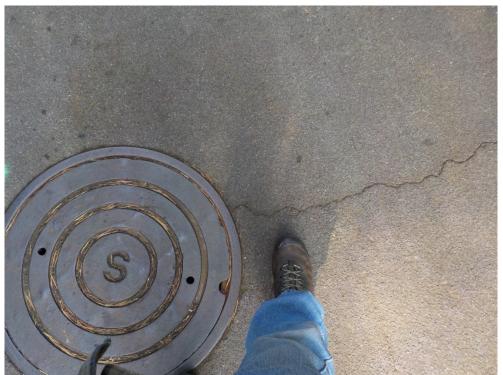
View of cracking in surface of Wildwood Drive near site.
